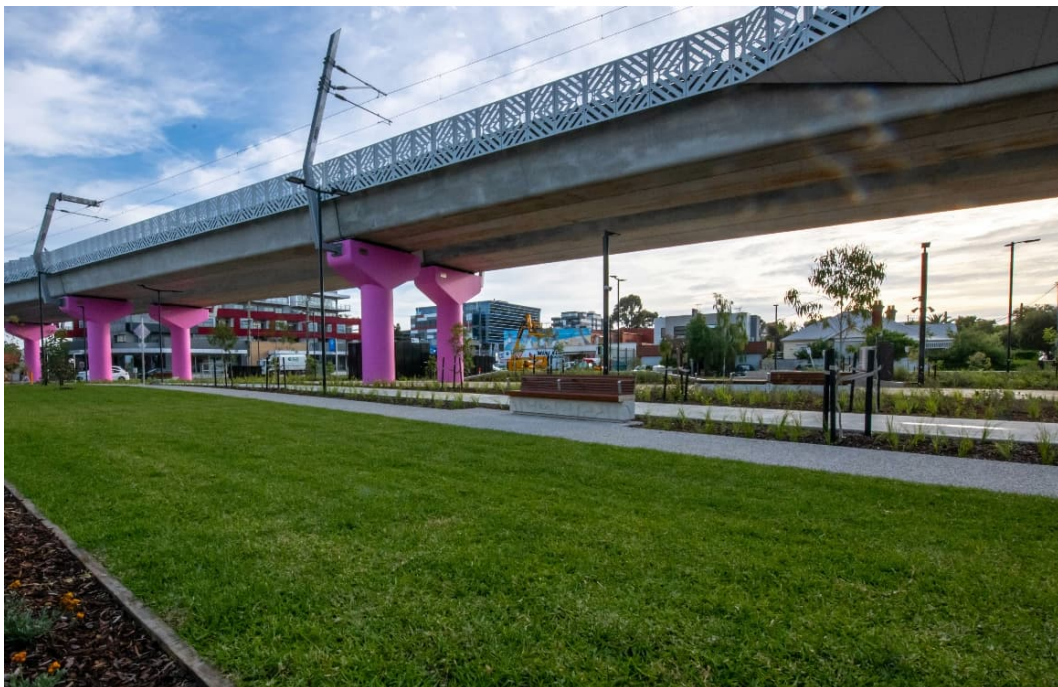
Bell Station rail bridge privacy screens on the elevated structure
